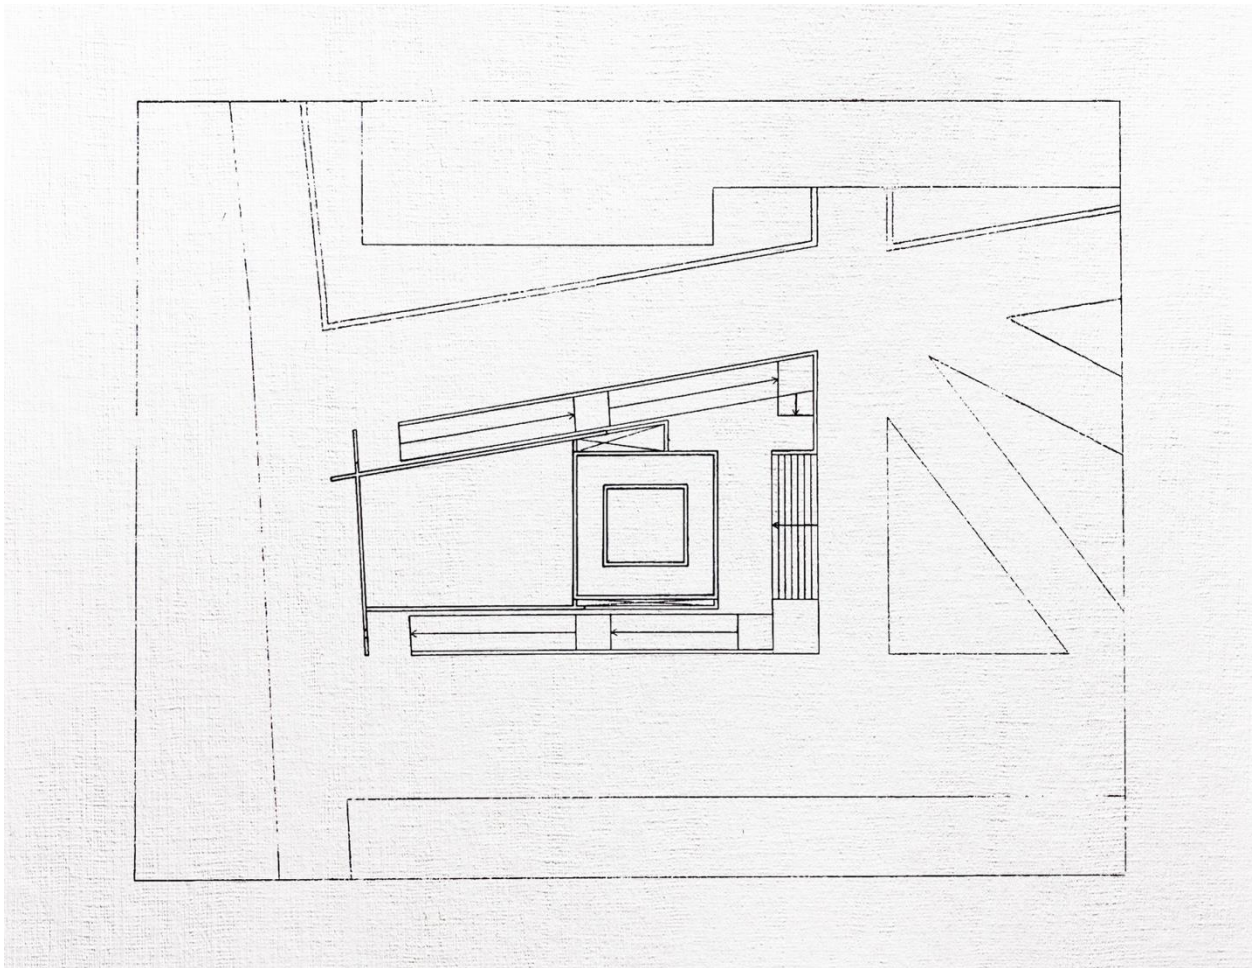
Image by Constanza Loustalet. Site Plan. 2020.
